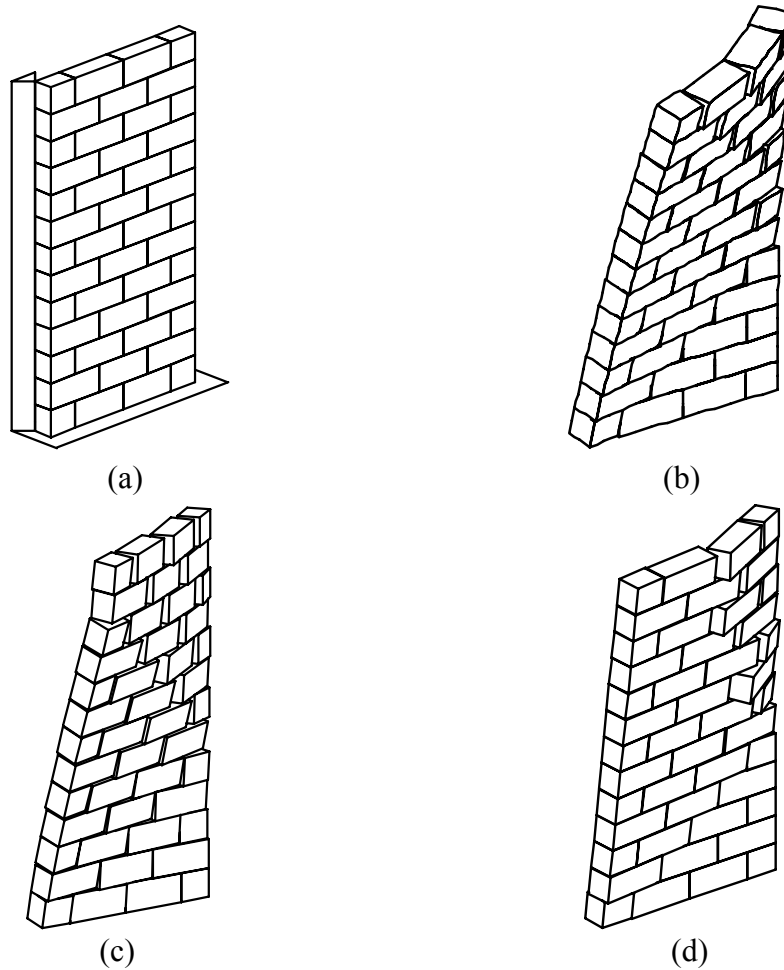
Masonry wall with out of plane loading; (a) model; (b) FEM failure mechanism; (c) limit analysis failure mechanism and (d) wrong failure mechanism
